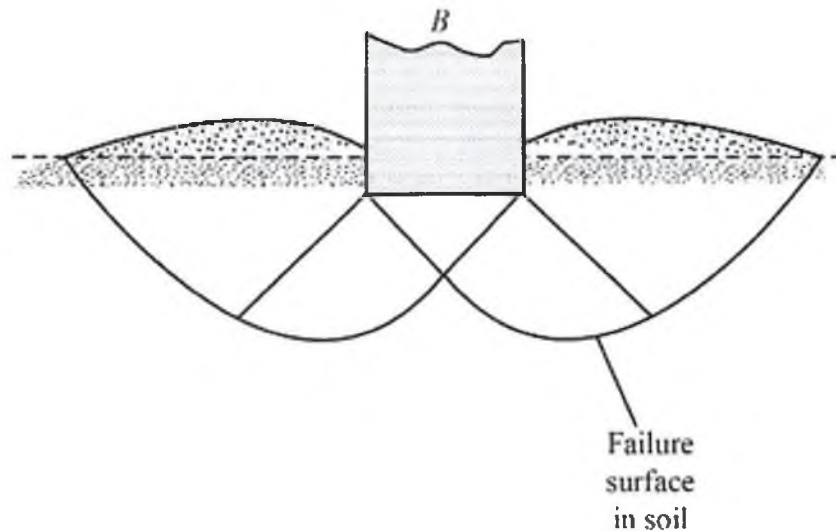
Typical Bearing Capacity Failure Surface
